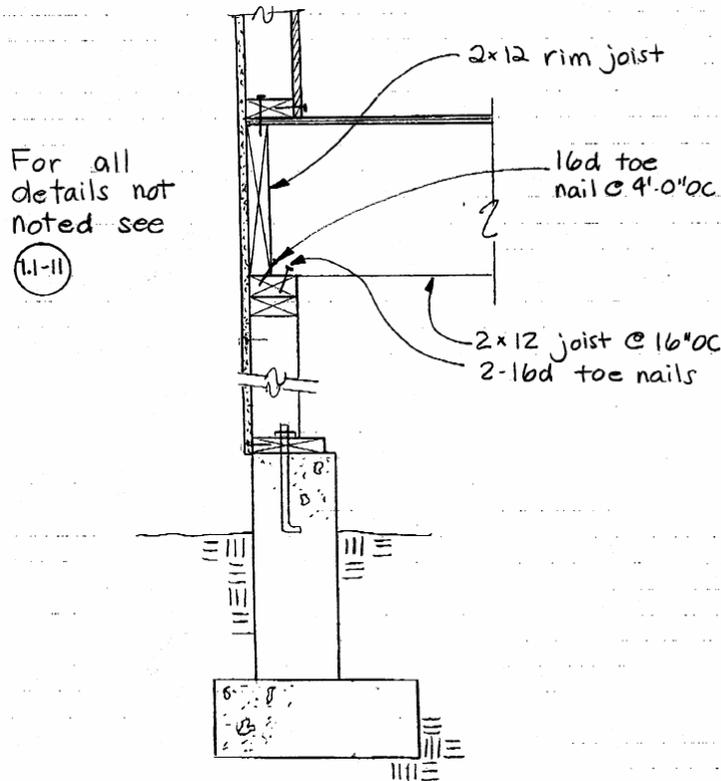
Exterior cripple wall perpendicular to joists (detail 11-S2)
